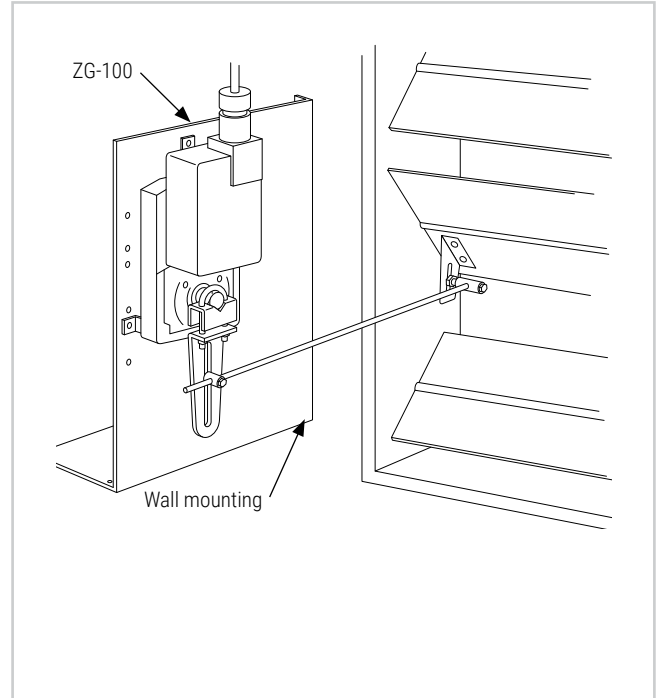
ZG-100 universal mounting bracket with crank arm, ball joints, and push rod for connecting the actuator to damper louvers
